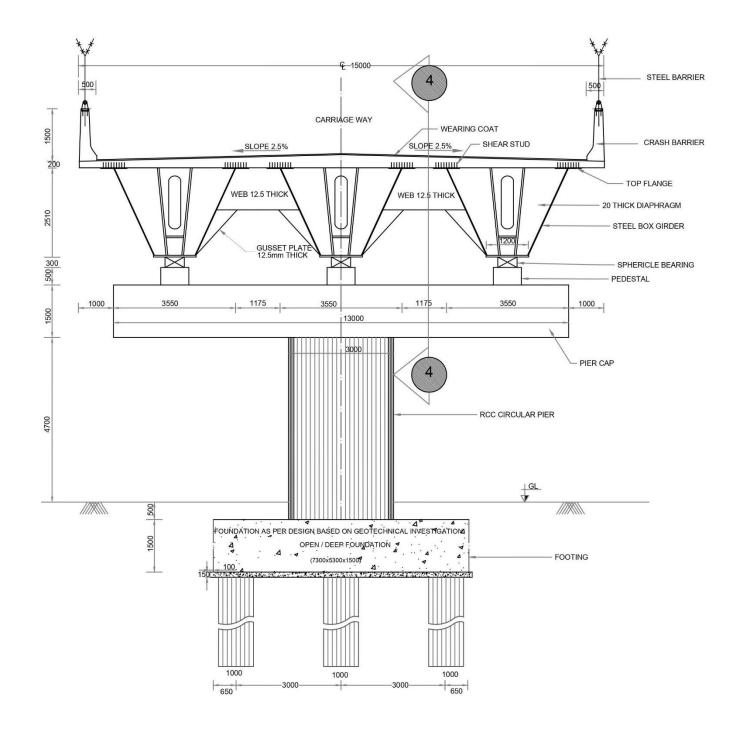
Sectional cross section of Trapezoidal box girder for 81.31 span
